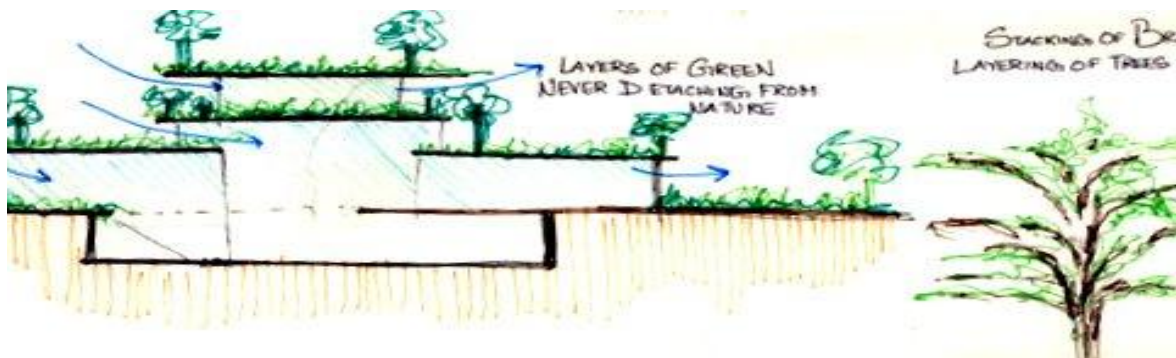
Sketch shows the idea of working with planes at multilayers deriving it from the branches of trees with clear openings in the north south directions so only horizontal planes emphasize
